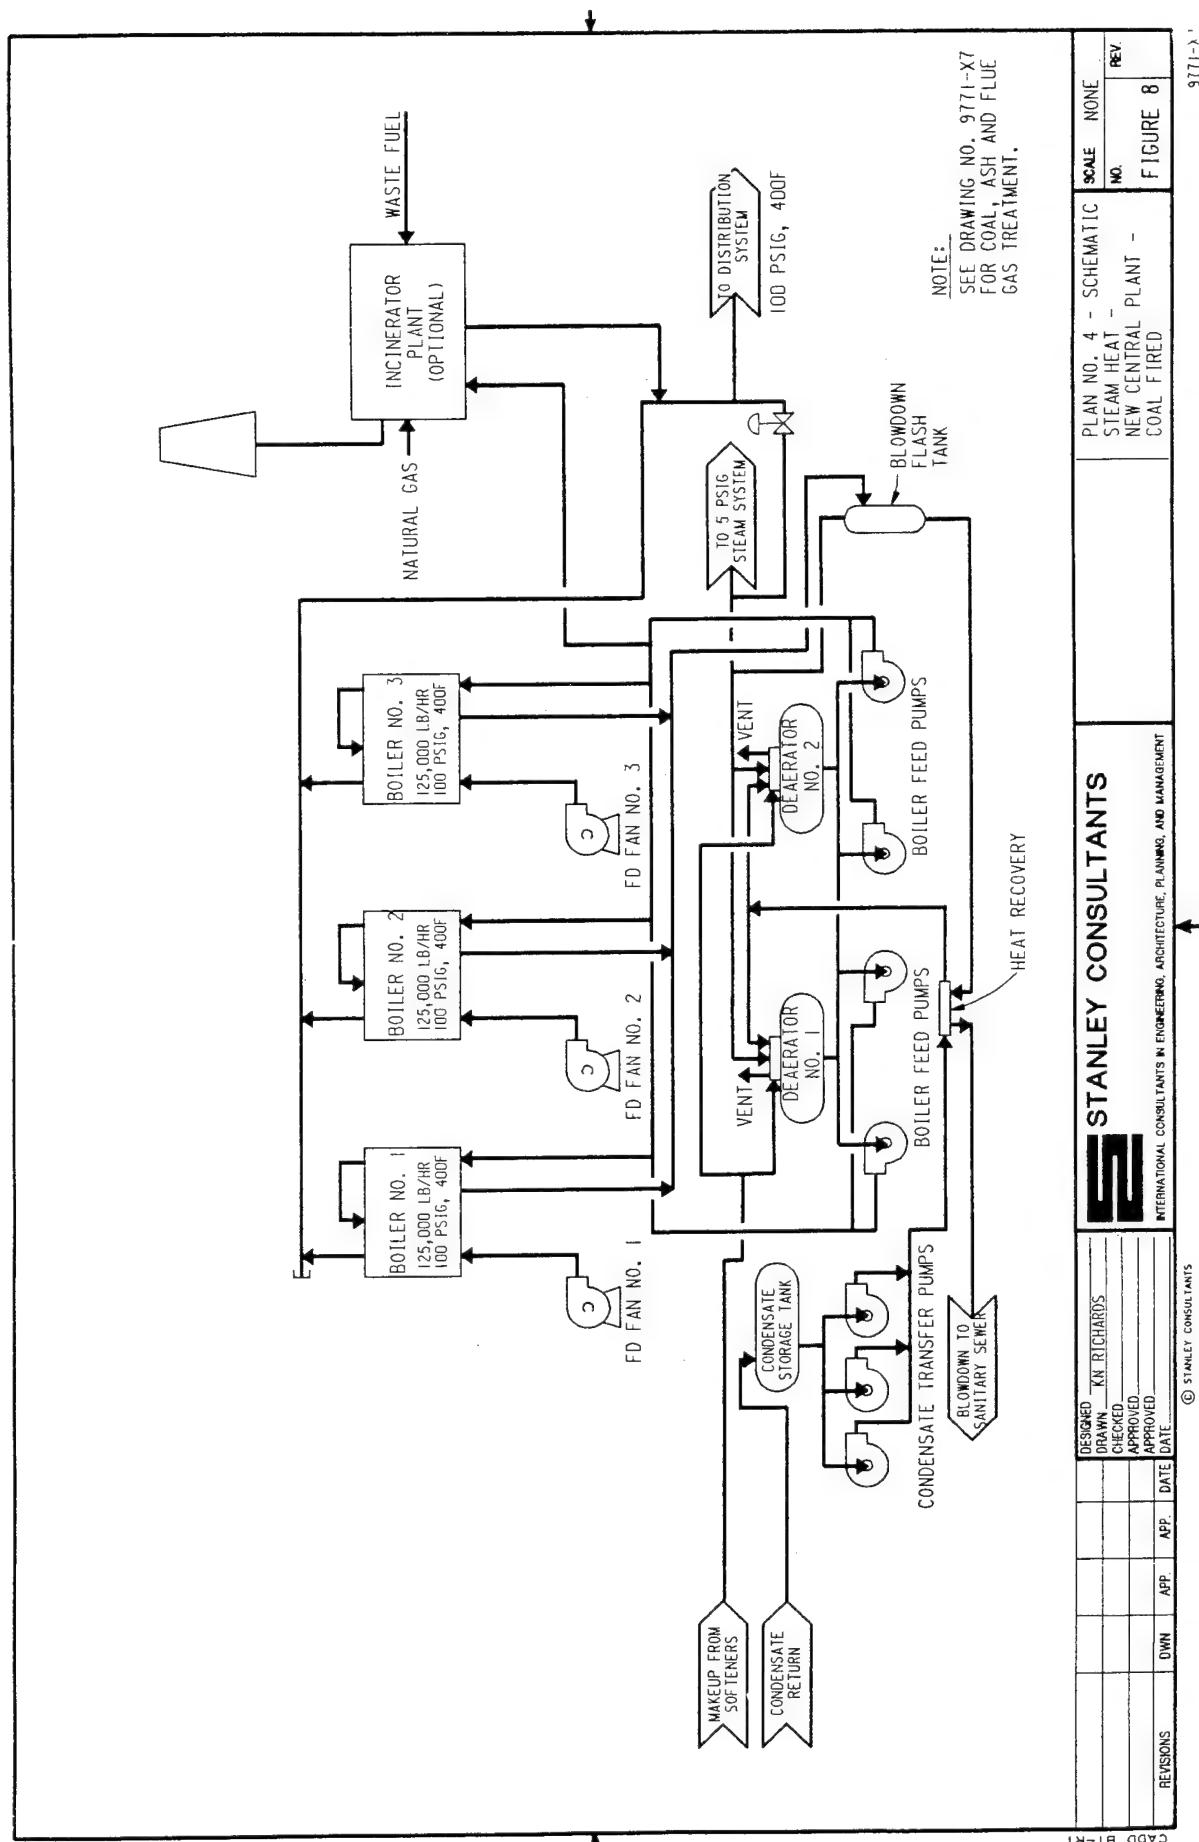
Schematic of Steam Heat—New Central Plant—Coal.
